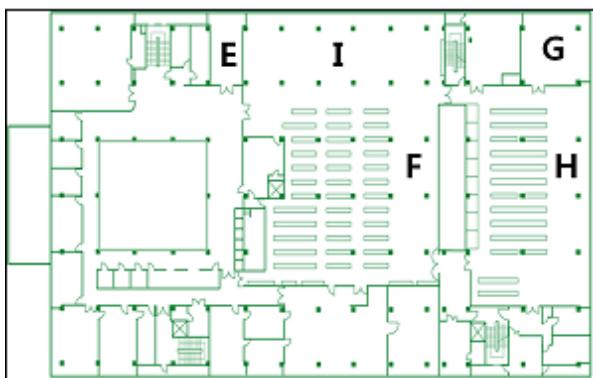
The 3rd Floor Plan of the Central Library of KUL
